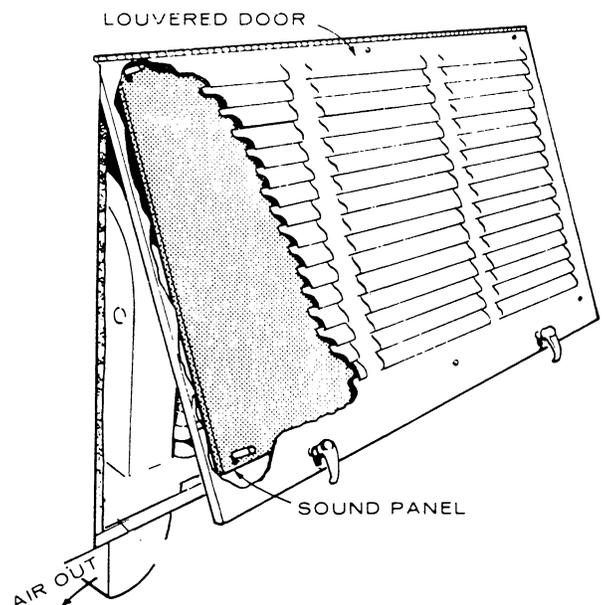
TYPICAL LOUVERED DOOR AIR INLET
